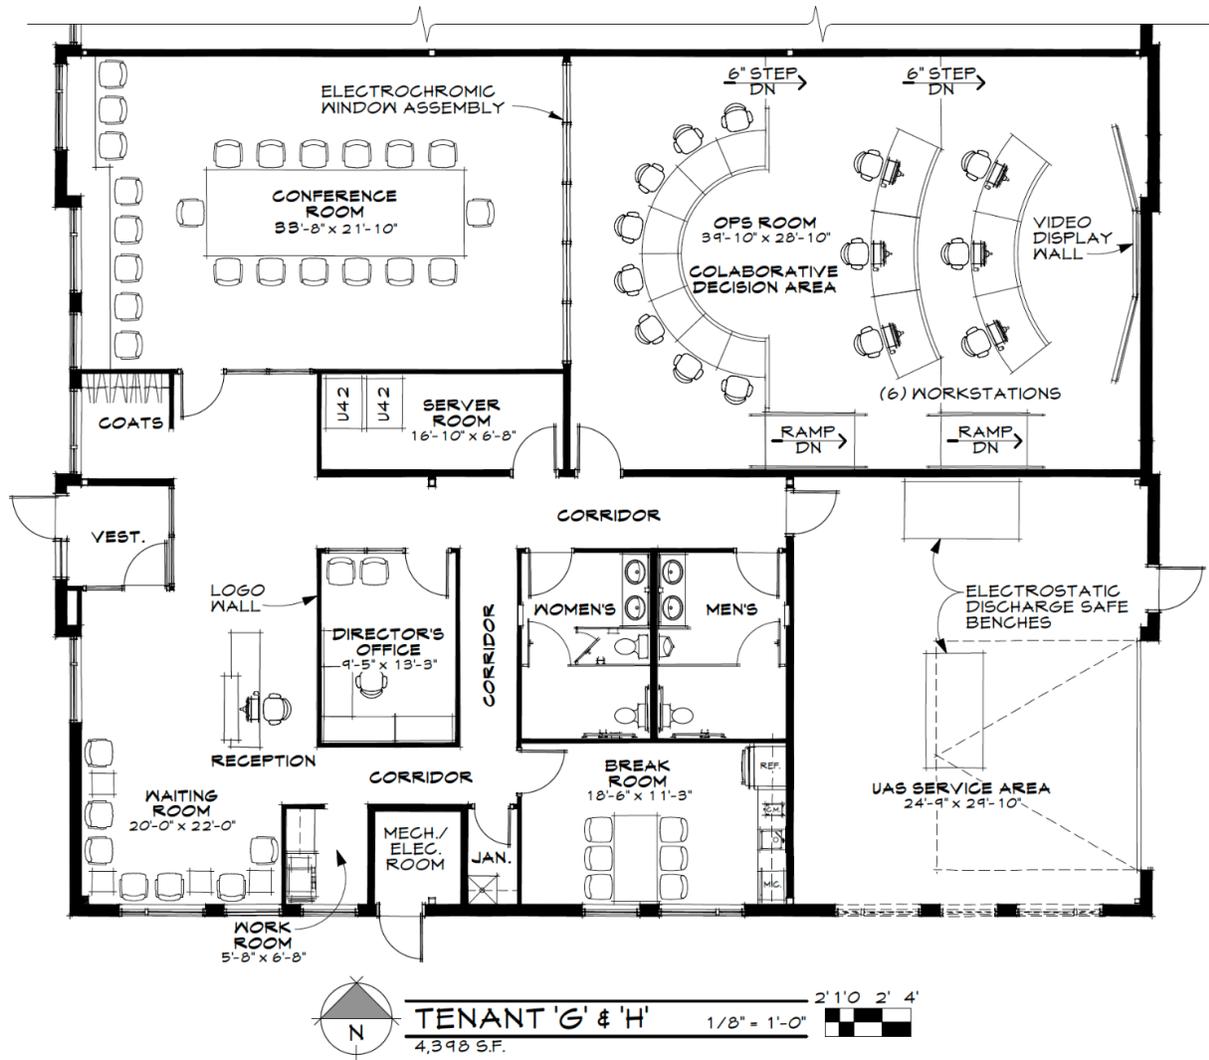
Example of Floorplan for C2 Center and Space Utilization
